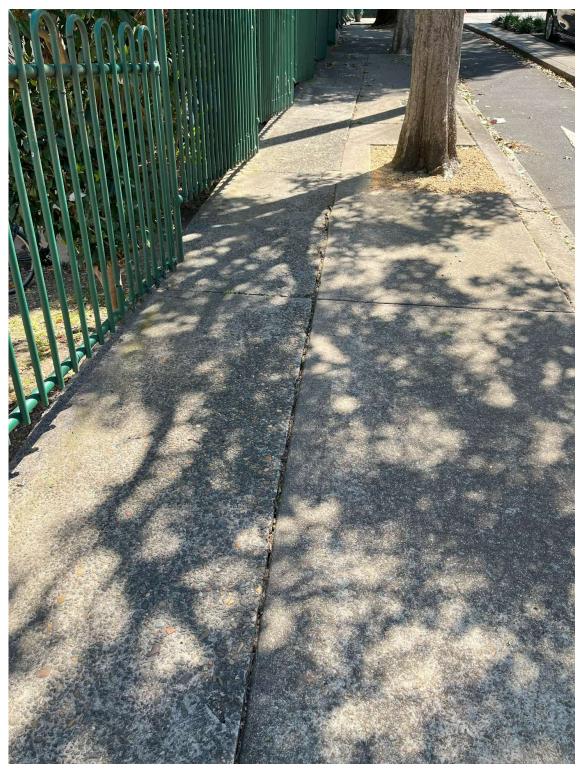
Western side of Junction Street approaching Bridge Road—also inaccessible to residents using walkers and wheelchairs—steep, with cracks and narrows at points to around 1 metre in width.
